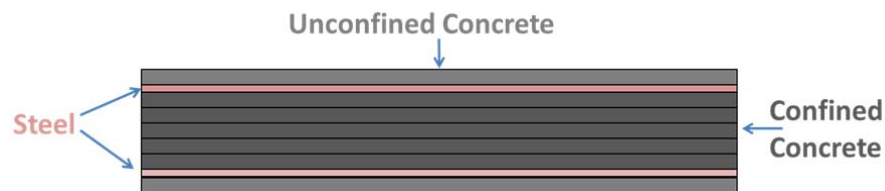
Layered Shell FE Model of Reinforced Concrete Composite Section
